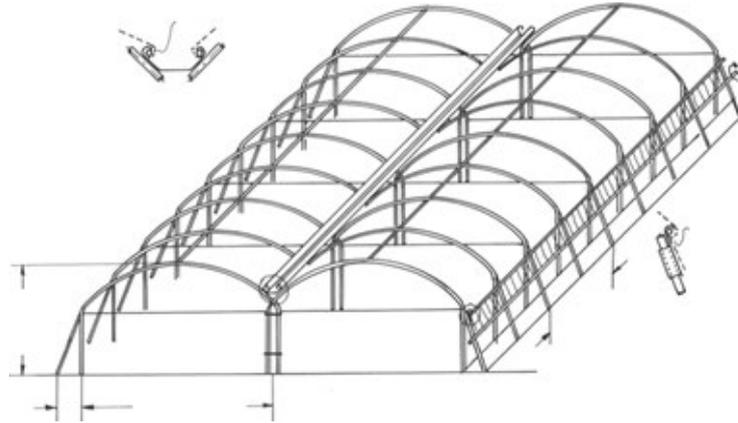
Round-arched greenhouse with sloped sidewalls
